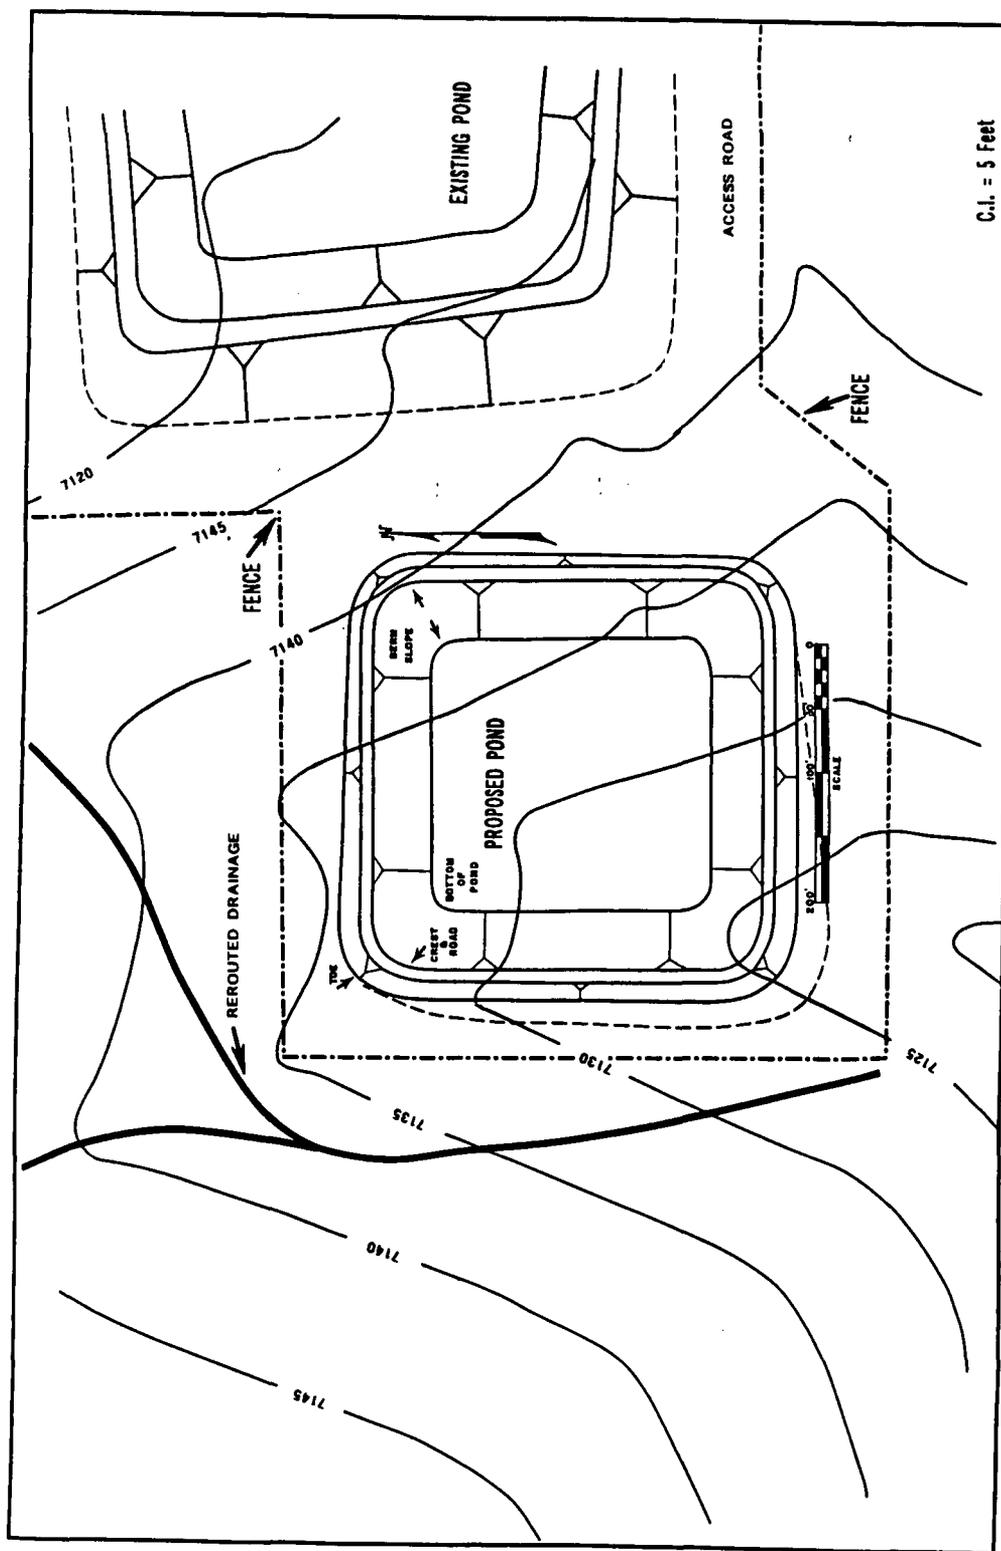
Plan map showing the location of the propose evaporation pond, existing ponds, and proposed fence line locations.
